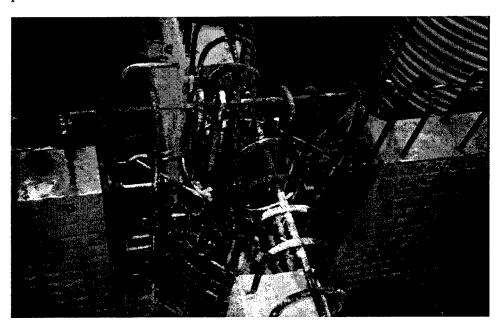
Congested reinforcing arrangement on Braddock Dam float-in segment
